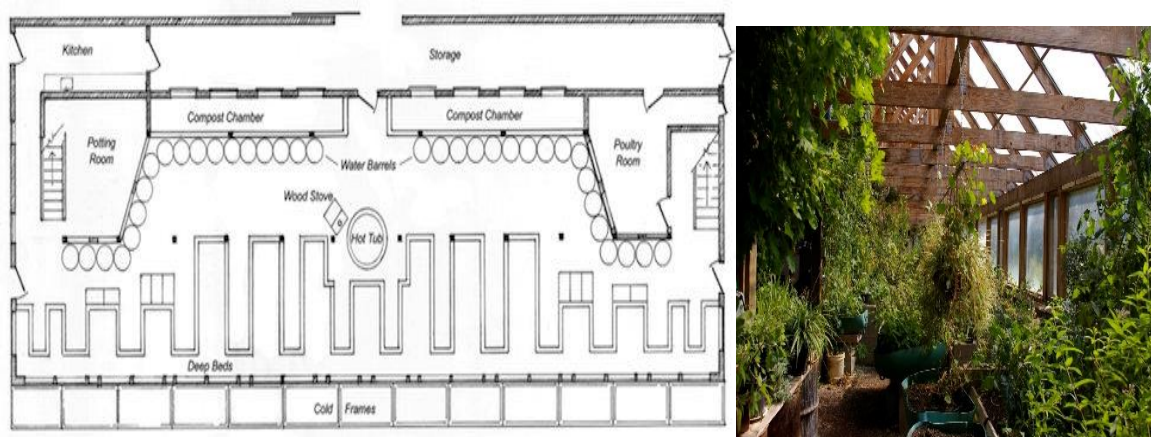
THE FLOOR PLAN AND INTERIOR OF THREE SISTERS BIOSHELTER, PA. (SOURCE: FREY, 2011)
